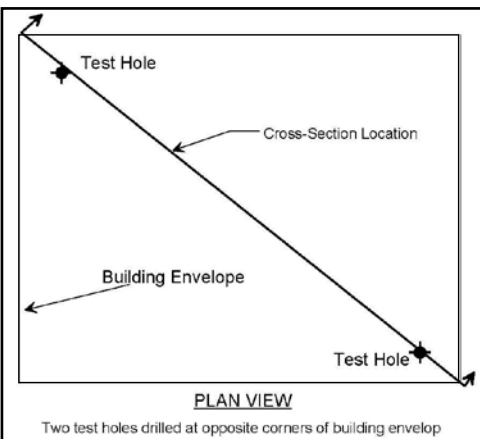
Plan view - illustration of an unknown geotechnical condition
